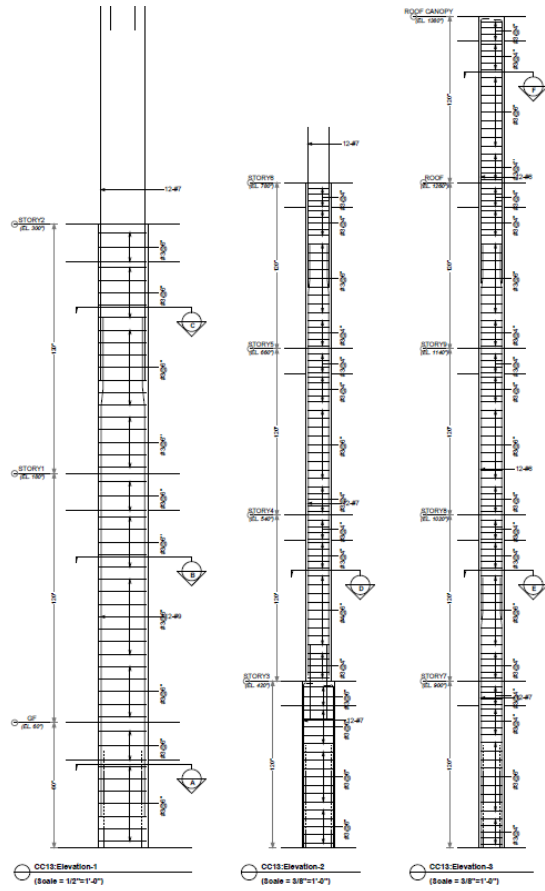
Column 12 & 13 (Longitudinal Rebar)
